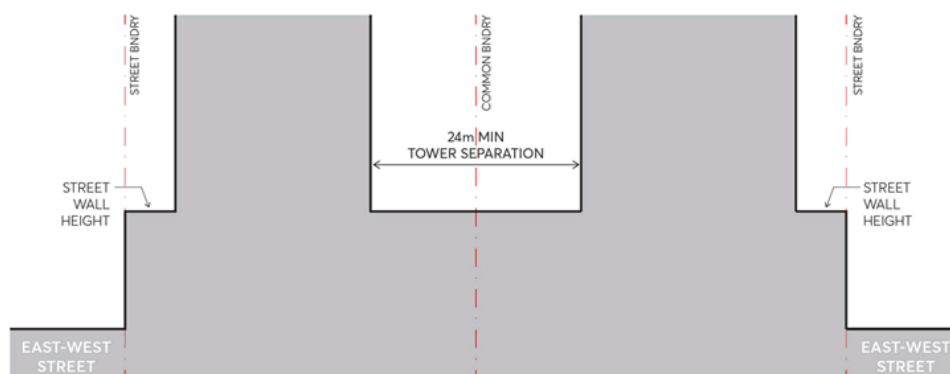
Tower separation between primarily north-south facing facades
